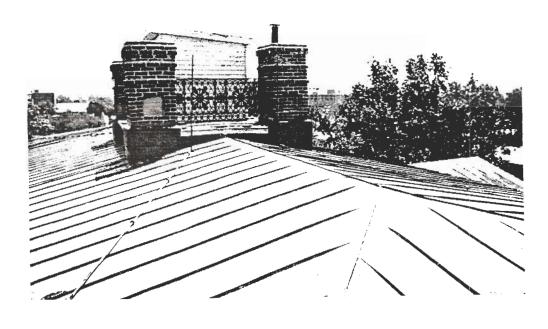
West Elevation of Chimneys and Roof Vent Structure Showing Hipped Roof.
